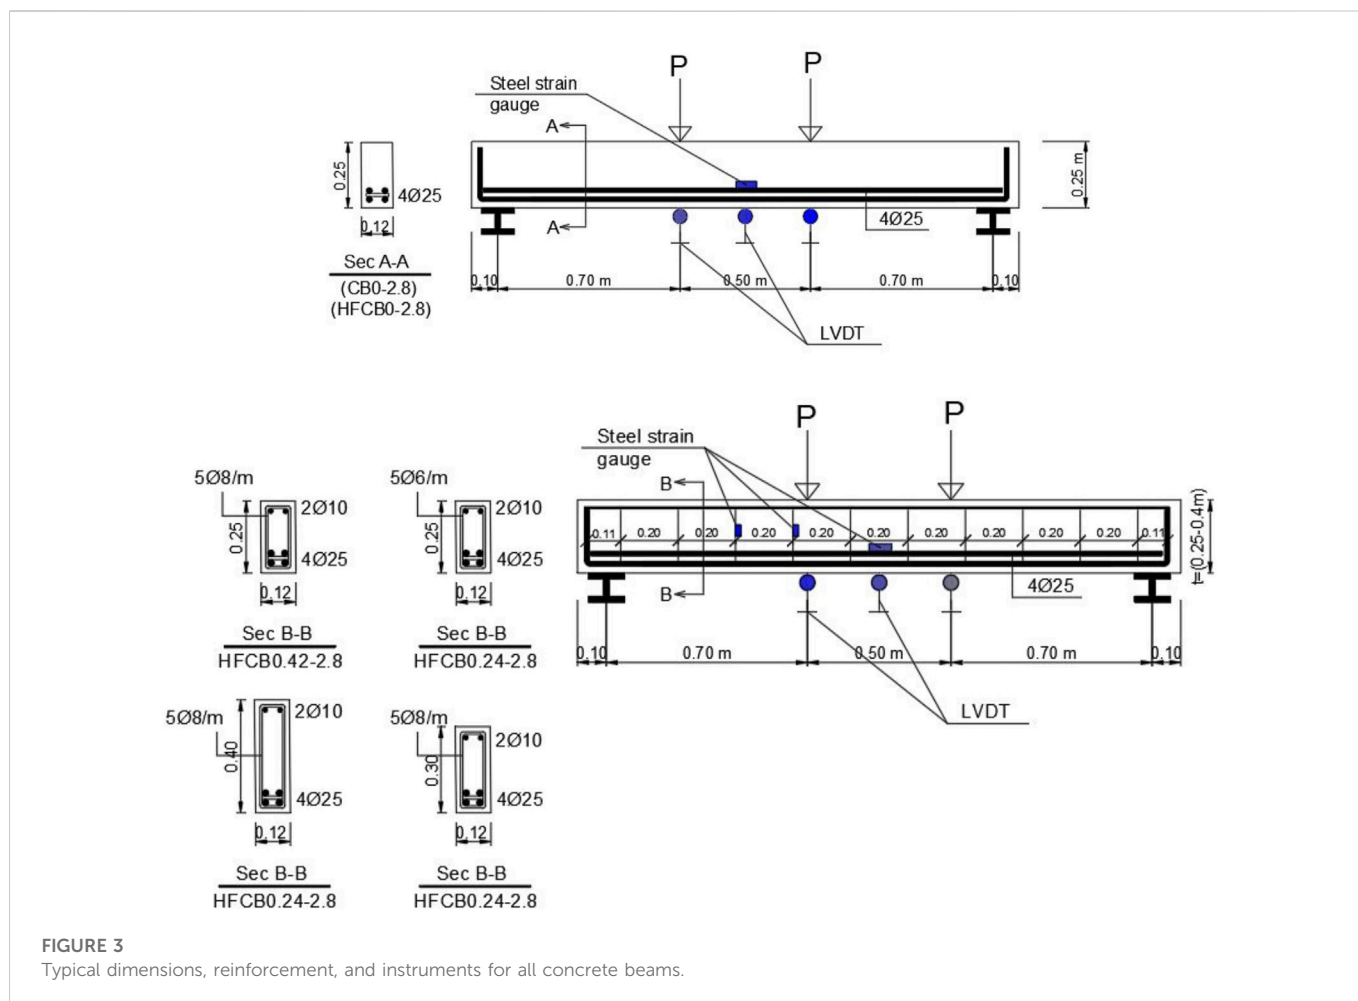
Typical dimensions, reinforcement, and instruments for all concrete beams.
